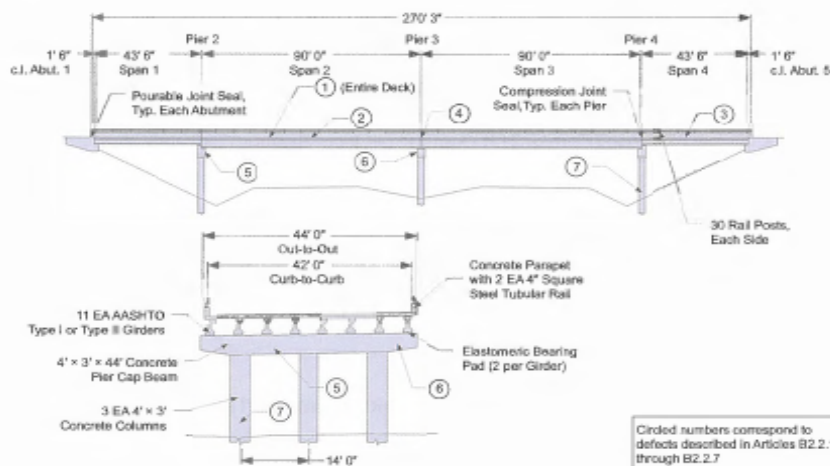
Elevation and Typical Section of Bridge for Prestressed Concrete Girder Bridge Example
